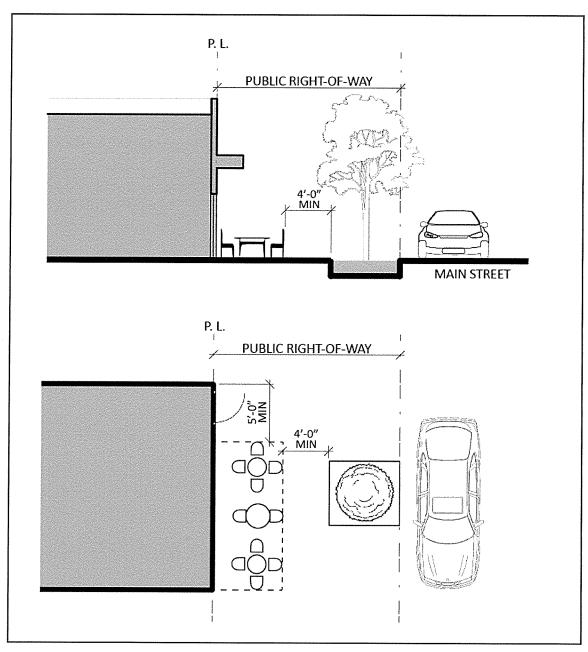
Example of an outdoor dining area in the public right-of-way abutting a storefront wall without a barrier.
